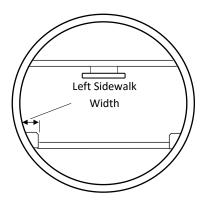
Sidewalk Width Looking in the Direction of Inventory
